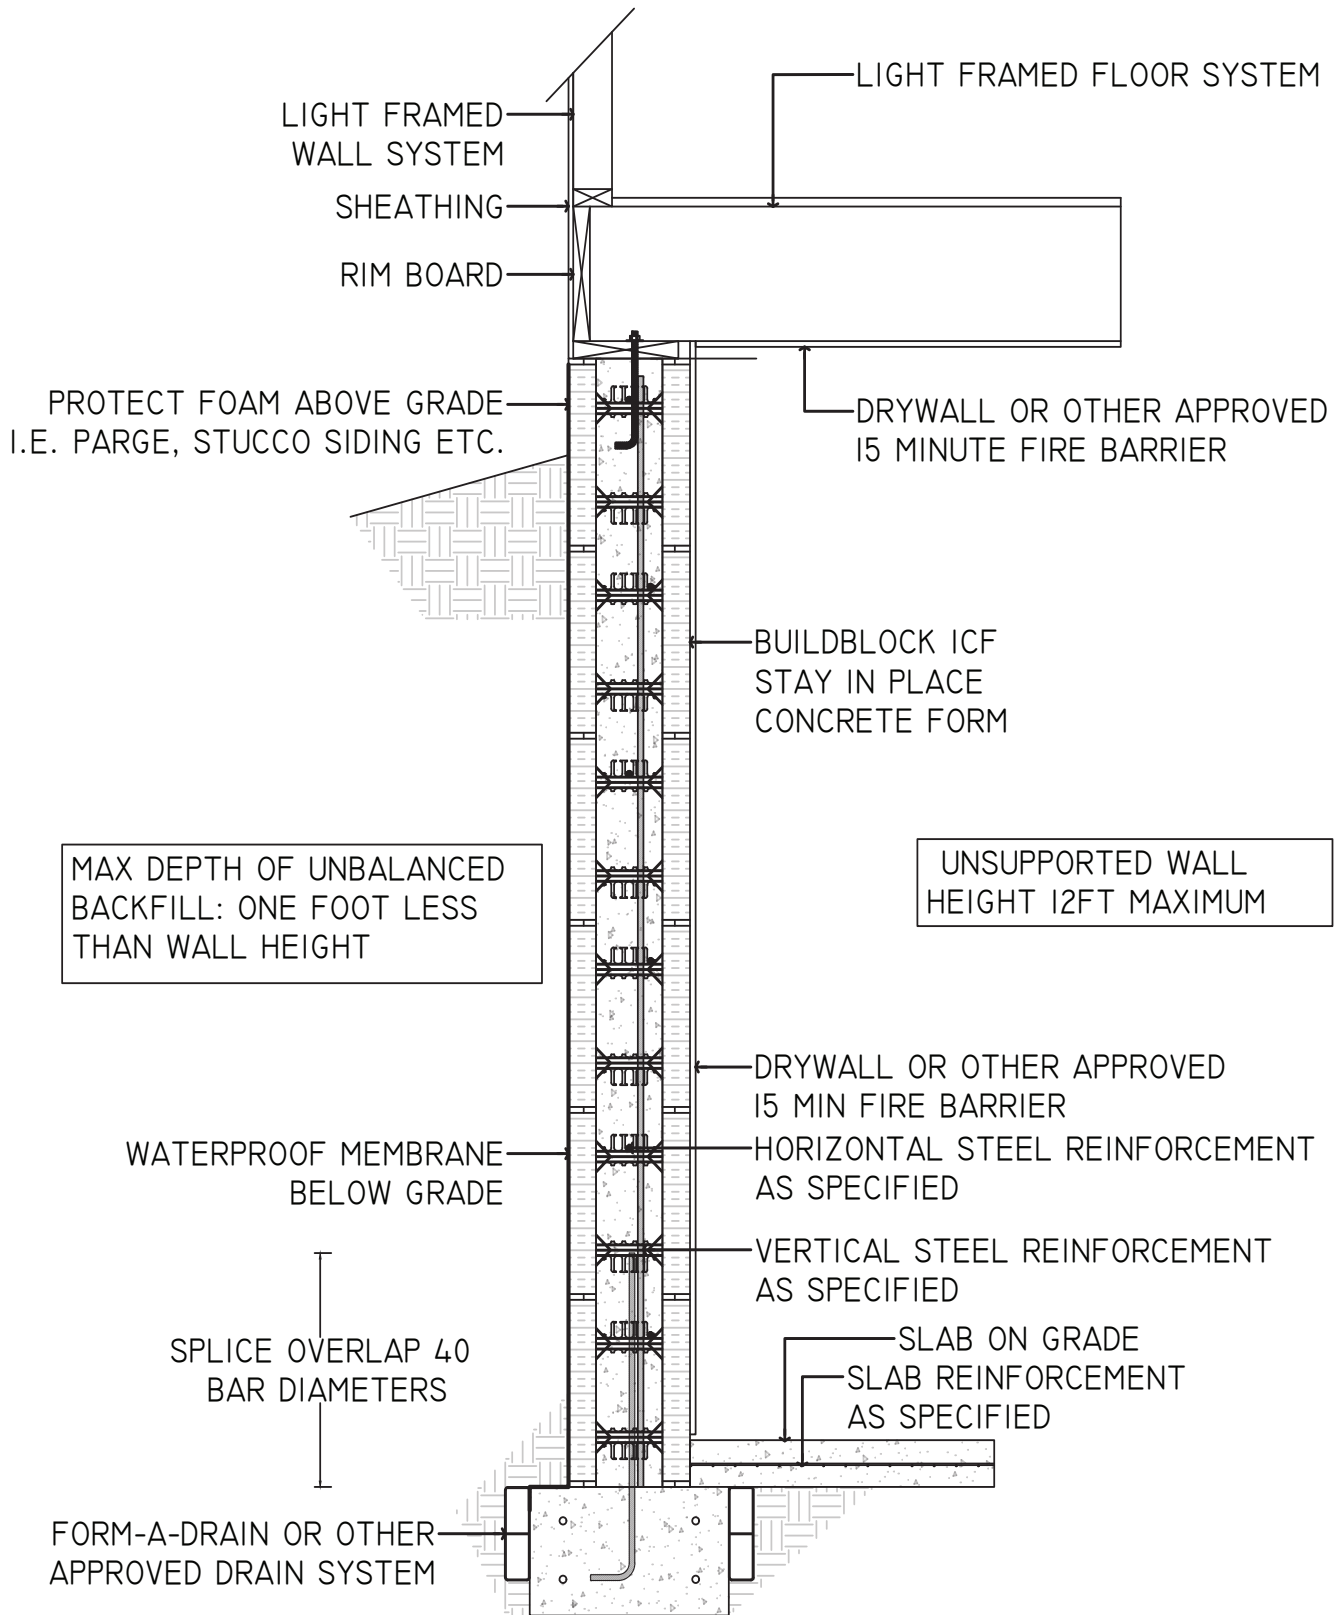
A TYPICAL BELOW GRADE BUILDBLOCK WALL SECTION CUT THROUGH FLAT WALL OR VERTICAL CORE OF SCREEN GRID WALL. SUPPORTING LIGHT FRAMED WALL.
